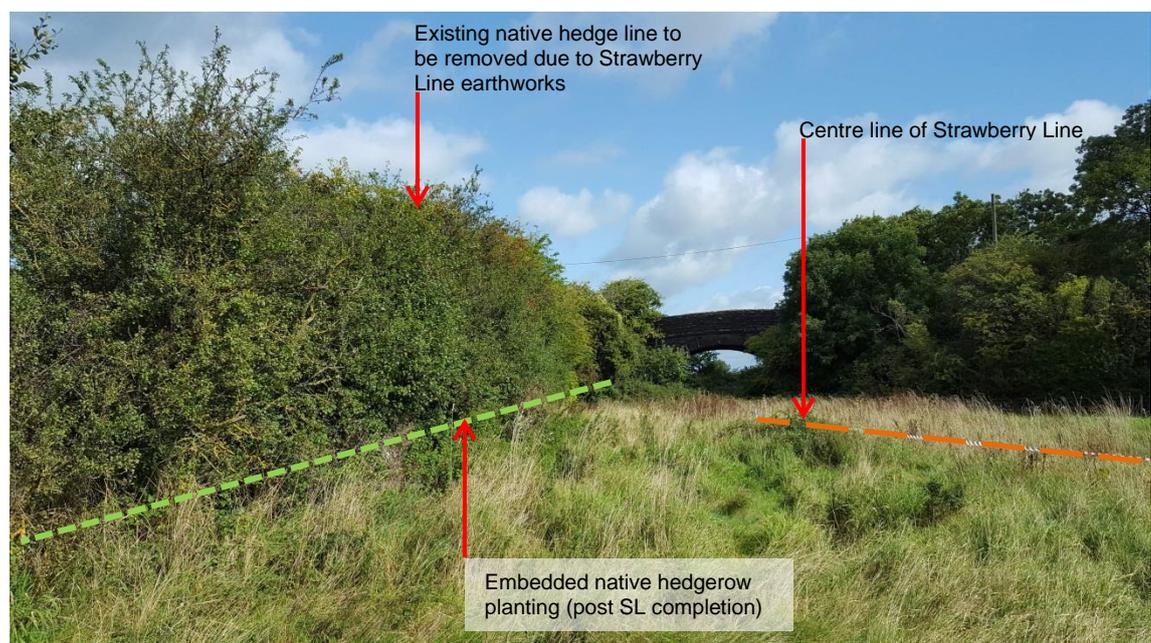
View looking north in Planting Phase Area C towards Nye Road Bridge
